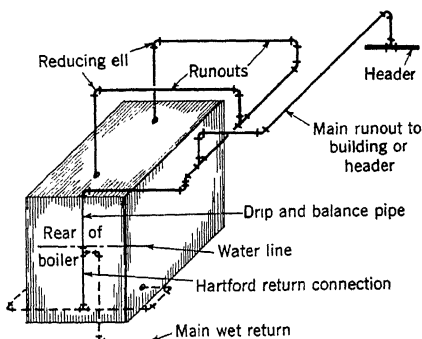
APPROVED METHOD OF BOILER CONNECTIONS
